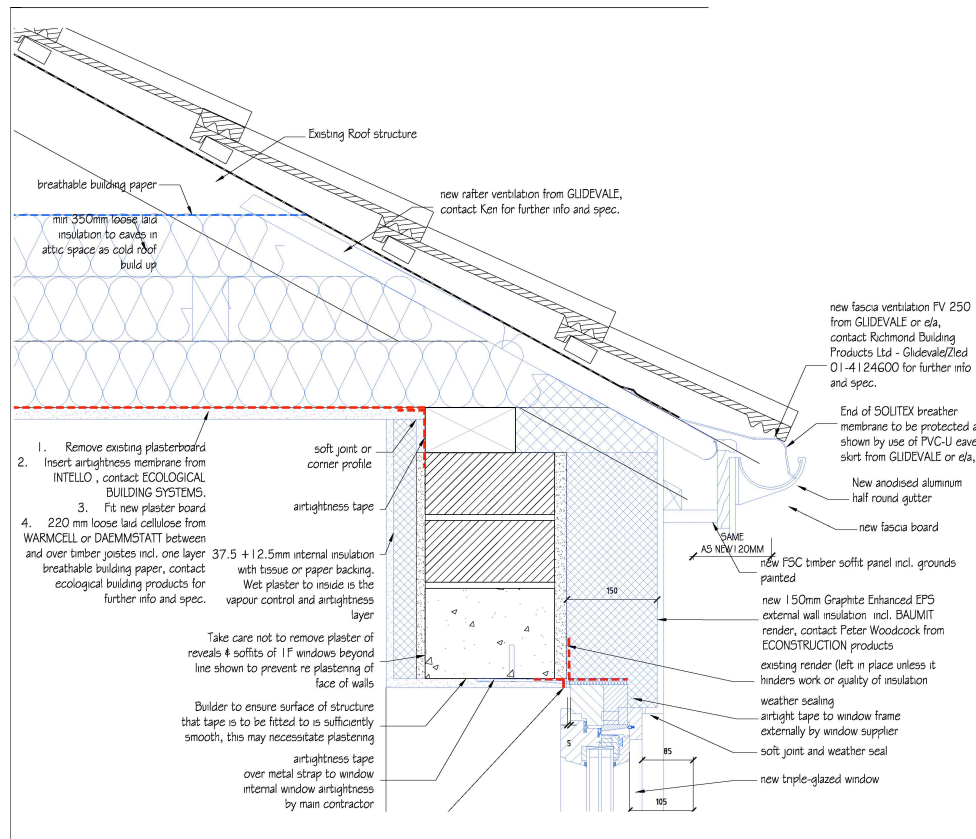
detail of existing roof and wall connection with new ceiling and wall insulation
